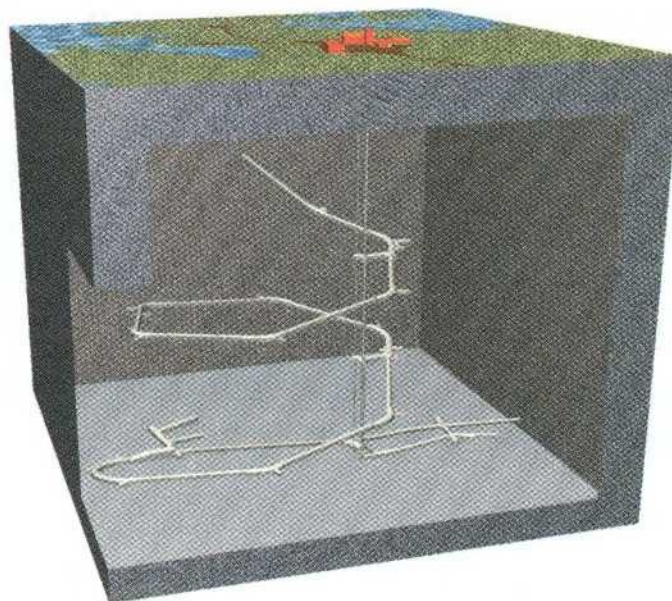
General layout of the Äspö HRL. The total length of the tunnel is 3600 m. The first part of the tunnel was excavated using the drill-and-blast technique. The last 400 metres were excavated using a Tunnel Boring Machine (TBM) with a diameter of 5 metres. The underground excavations are connected to the Äspö Research Village, containing offices, stores, hoist and ventilation building, by a hoist shaft and two ventilation shafts.
